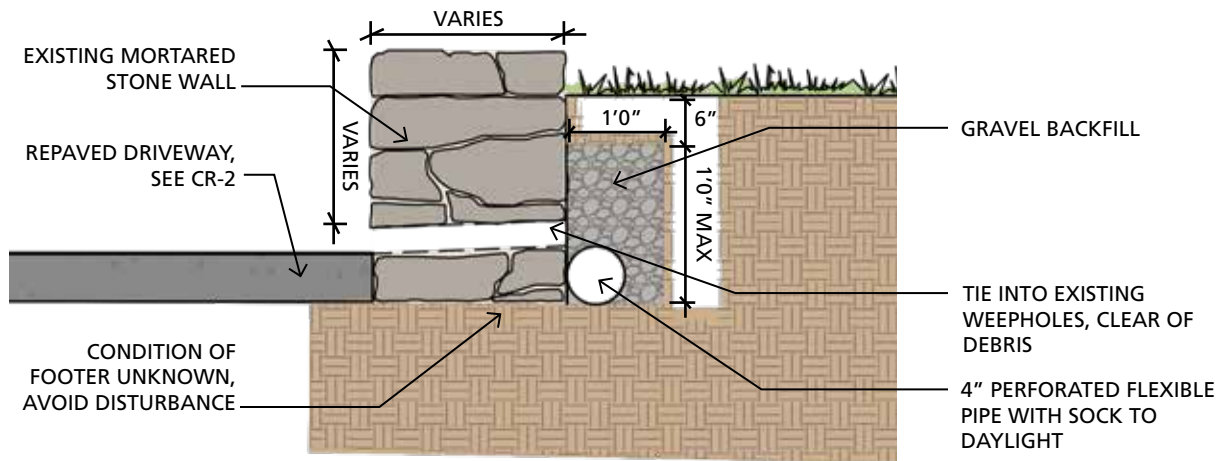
View of potential additional drainage behind existing retaining wall. (Source: WLA Studio.)
